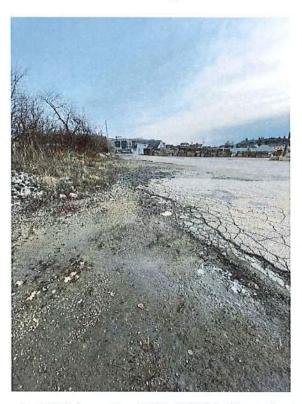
Edge of concrete block wall at 90 Maplewood Ave LLC lot (right) looking northeast over existing pipe. Taken 1/19/23
